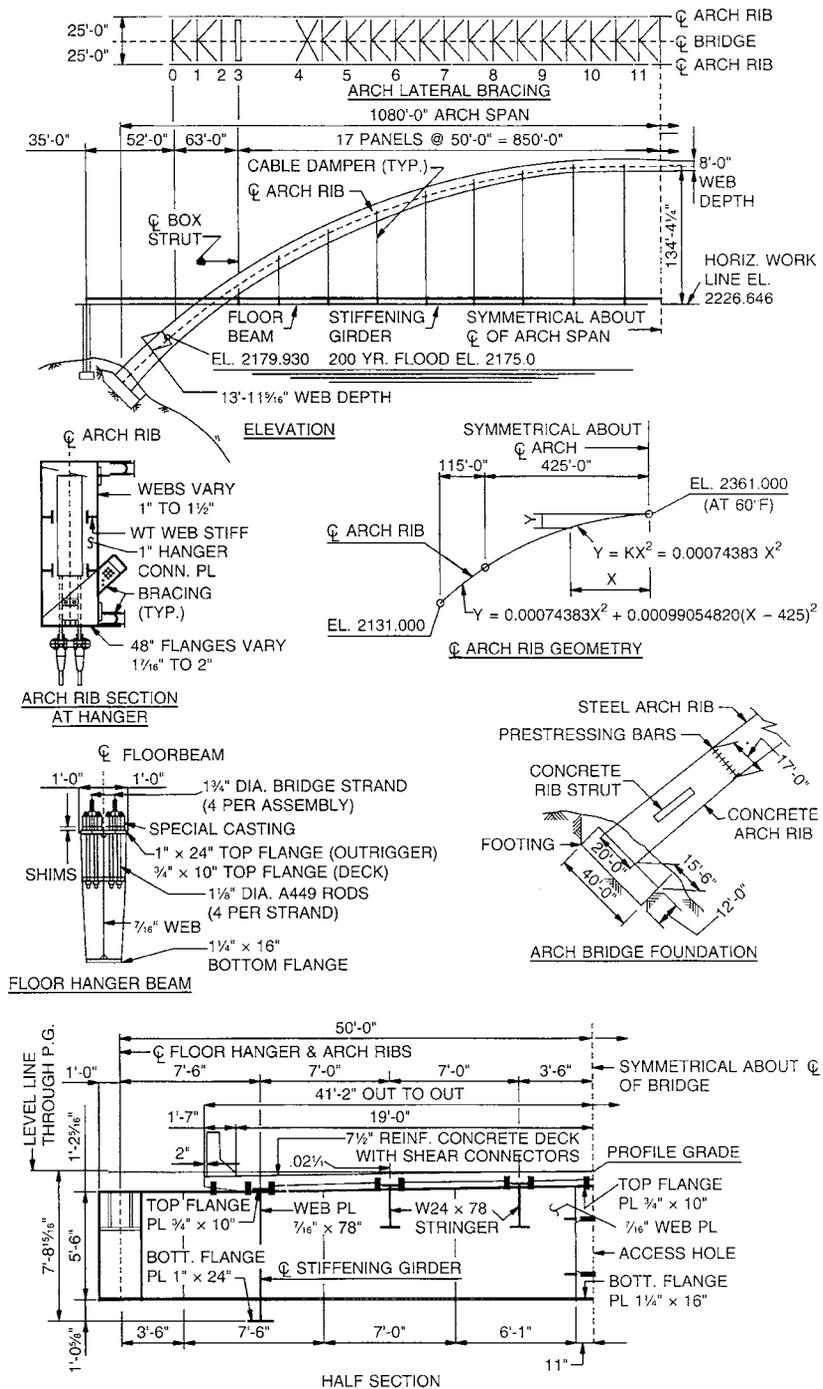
Details of Roosevelt Lake Bridge.
